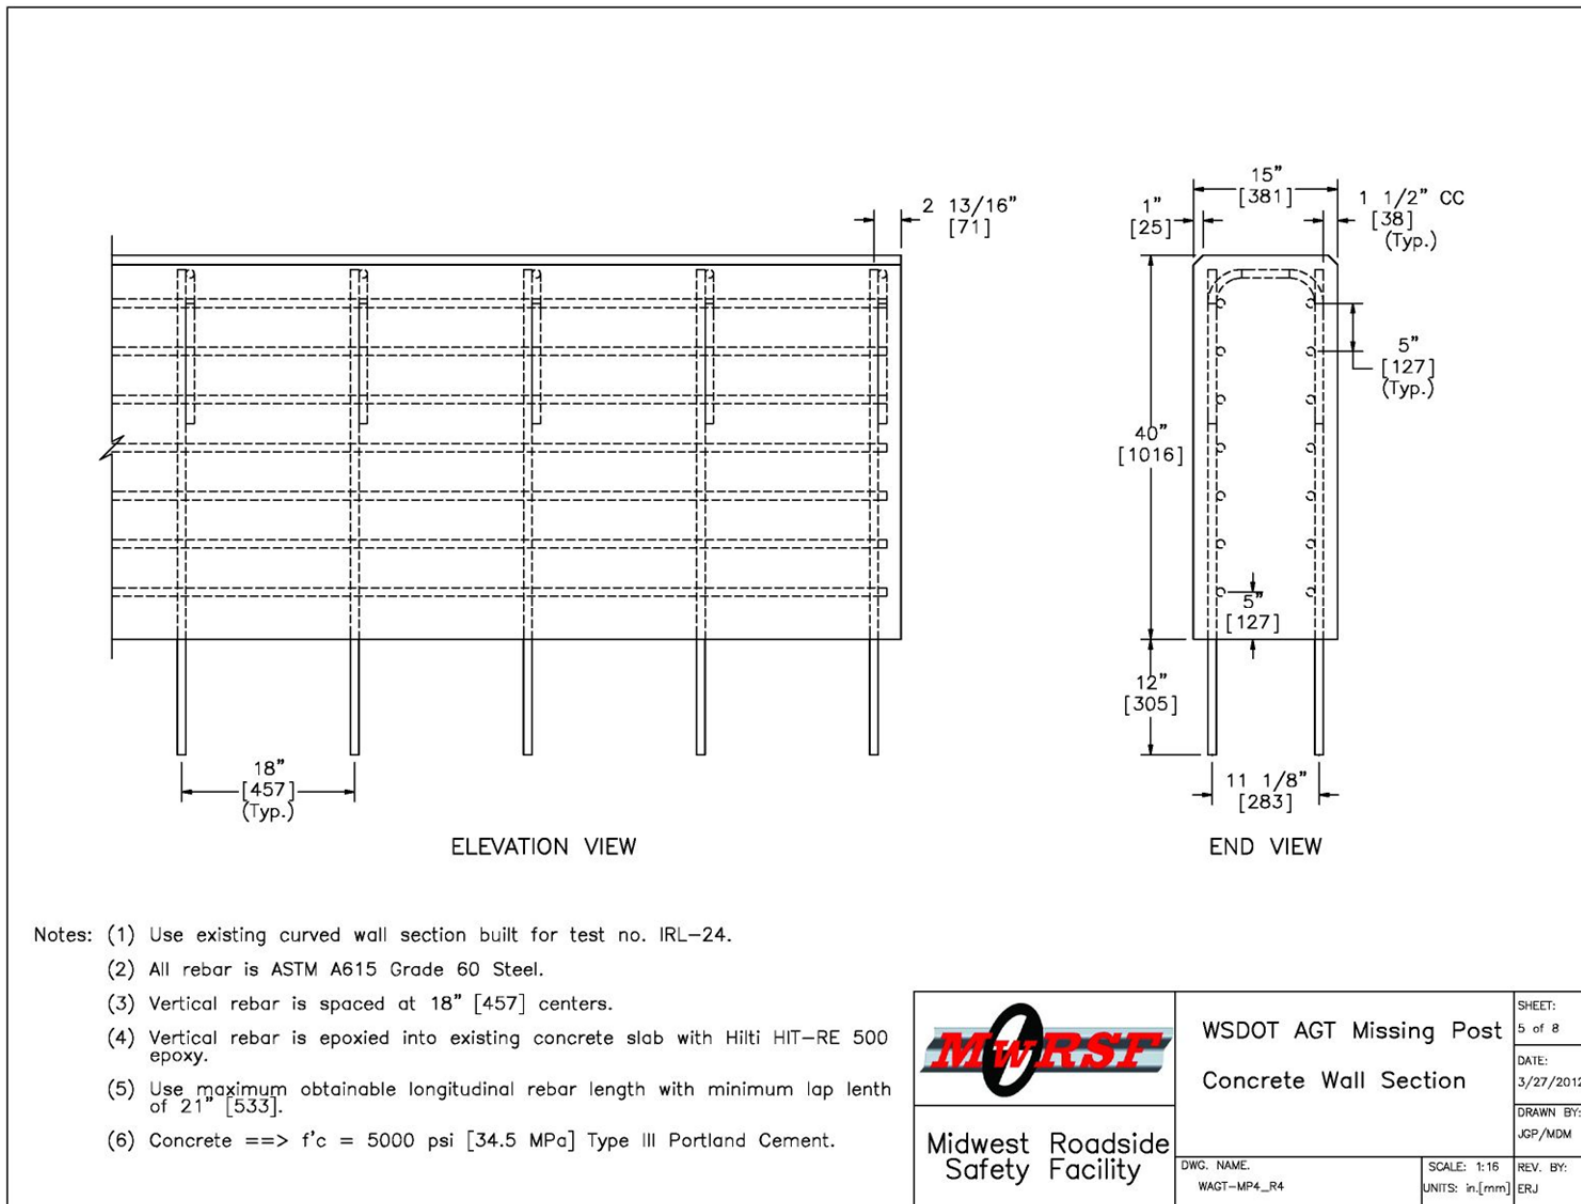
WAGTMP Bogie Testing Concrete Wall Reinforcement Layout
